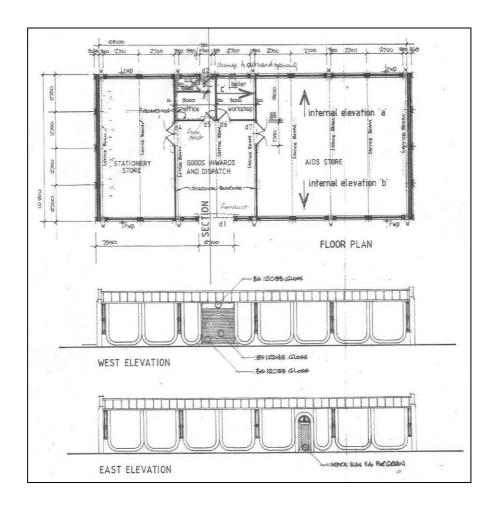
Proposed floor plan and elevations for a new store at Northfields dated July 1984
